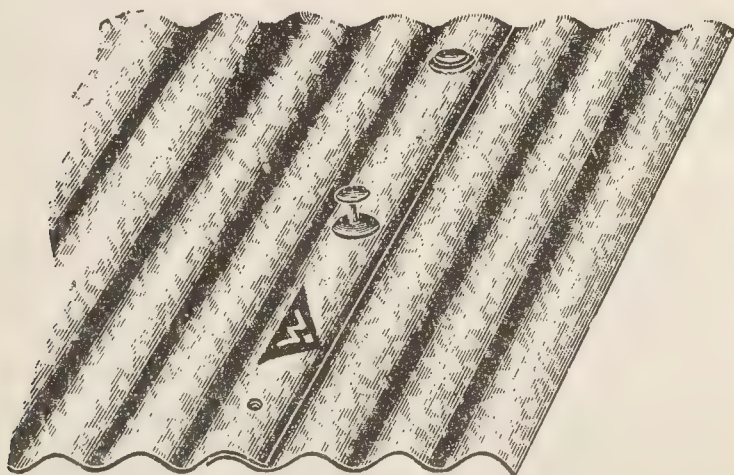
,047.—Wensley corrugated sheets as attached to roof with nails and washers. About 225 washers to the pound and require about ⅓ lb. to lay a square.
